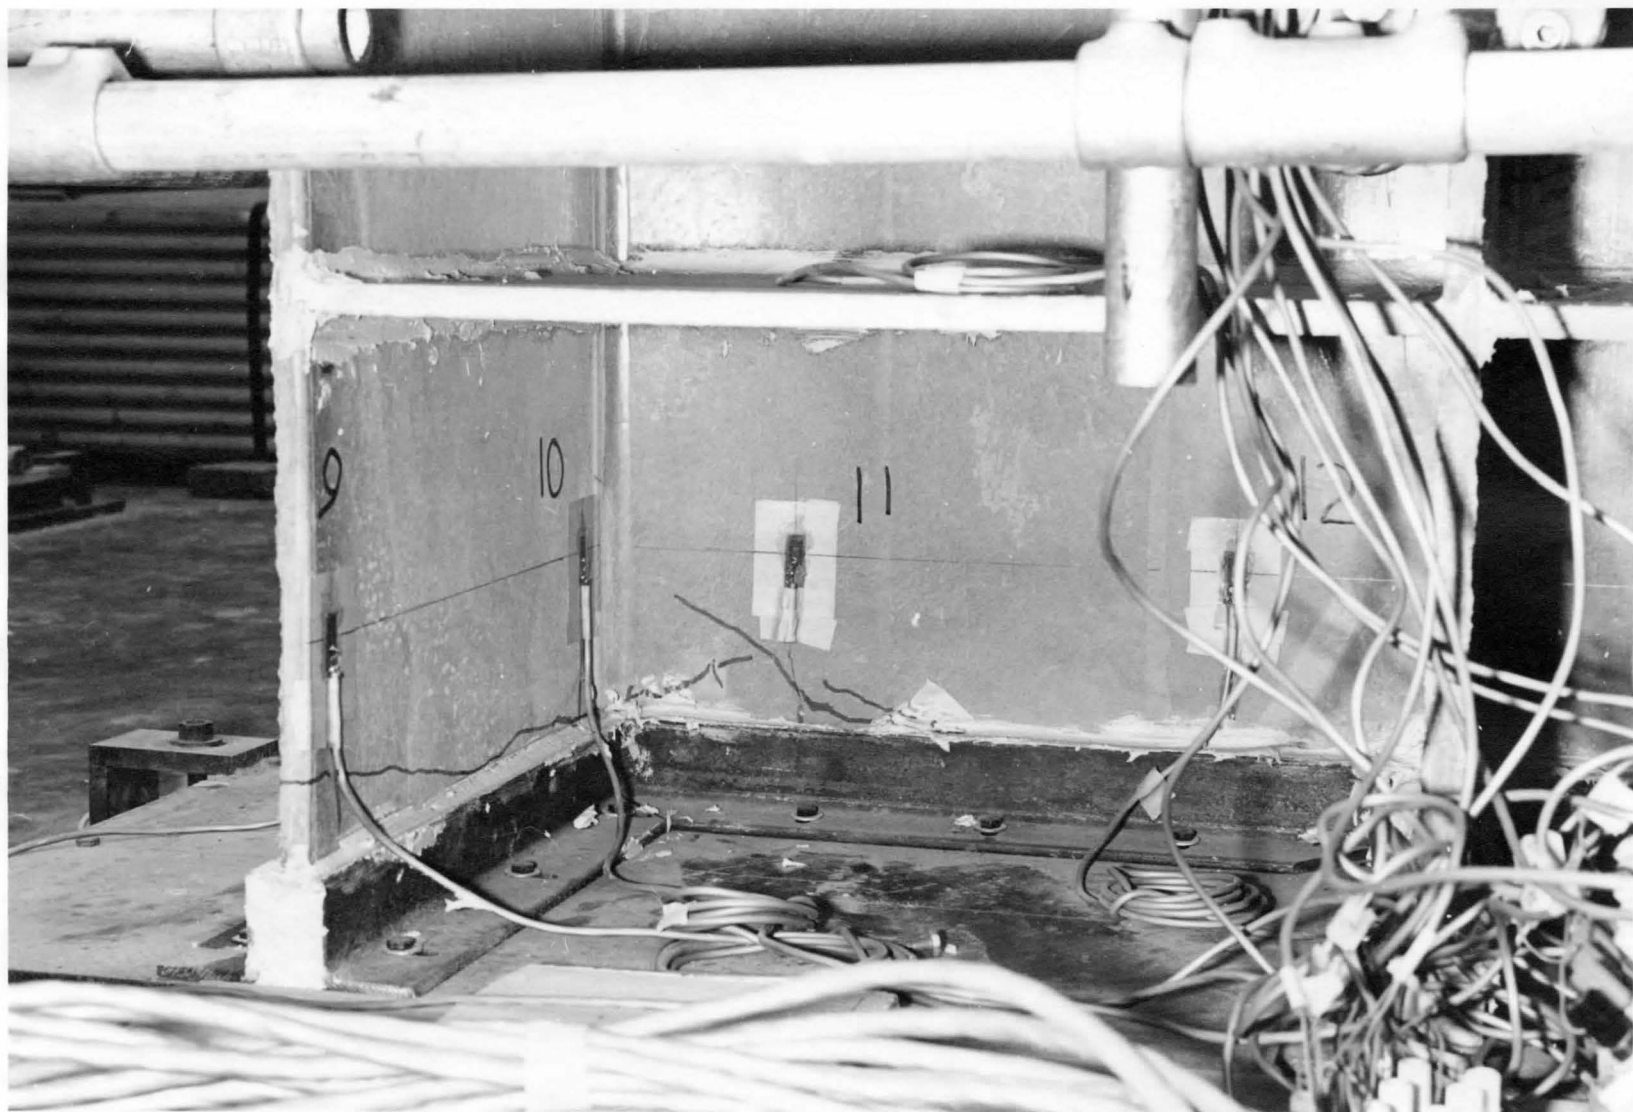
CRACKING PATTERN ALONG FLANGE 3 OF BUILDING 1
